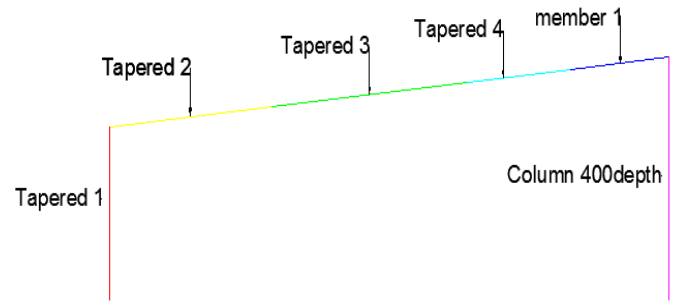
Cross sectional view of various Tapered Sections assigned for PEB
